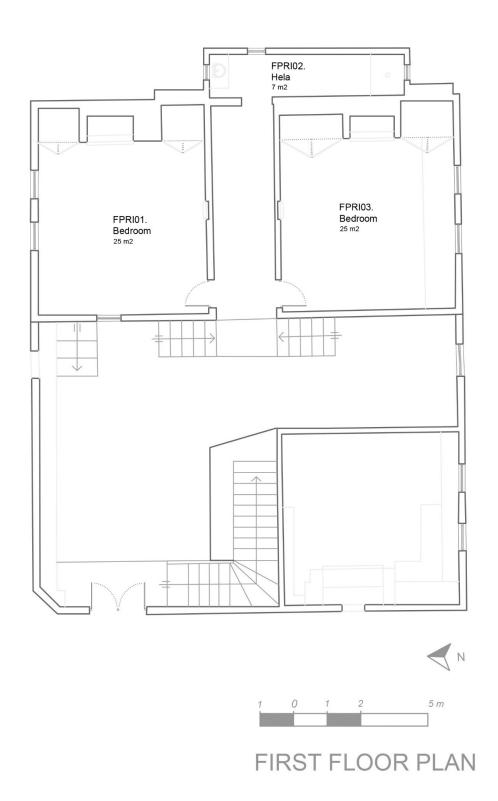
Pre-intervention first floor layout of Hacı Rıfatlar House. (redrawn by the Author, 2023)
